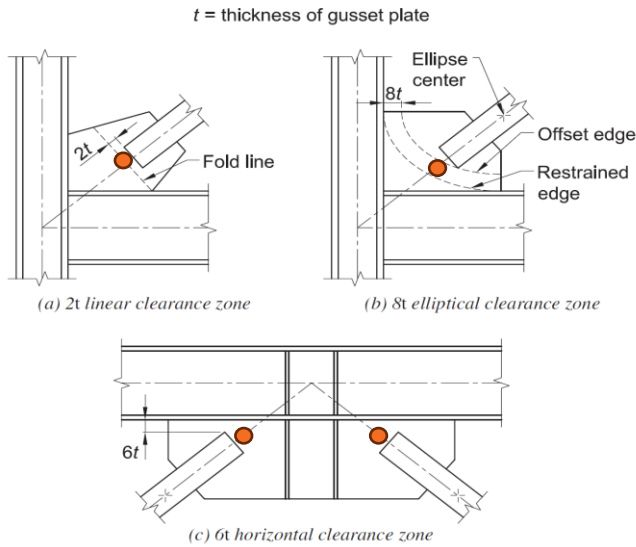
Brace-to-gusset plate requirement for buckling out-of-plane bracing system.
